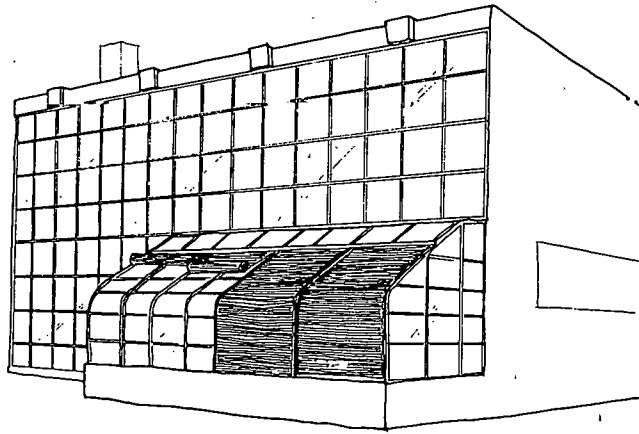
Doug Kelbaugh's House: Trombe Wall and Greenhouse
